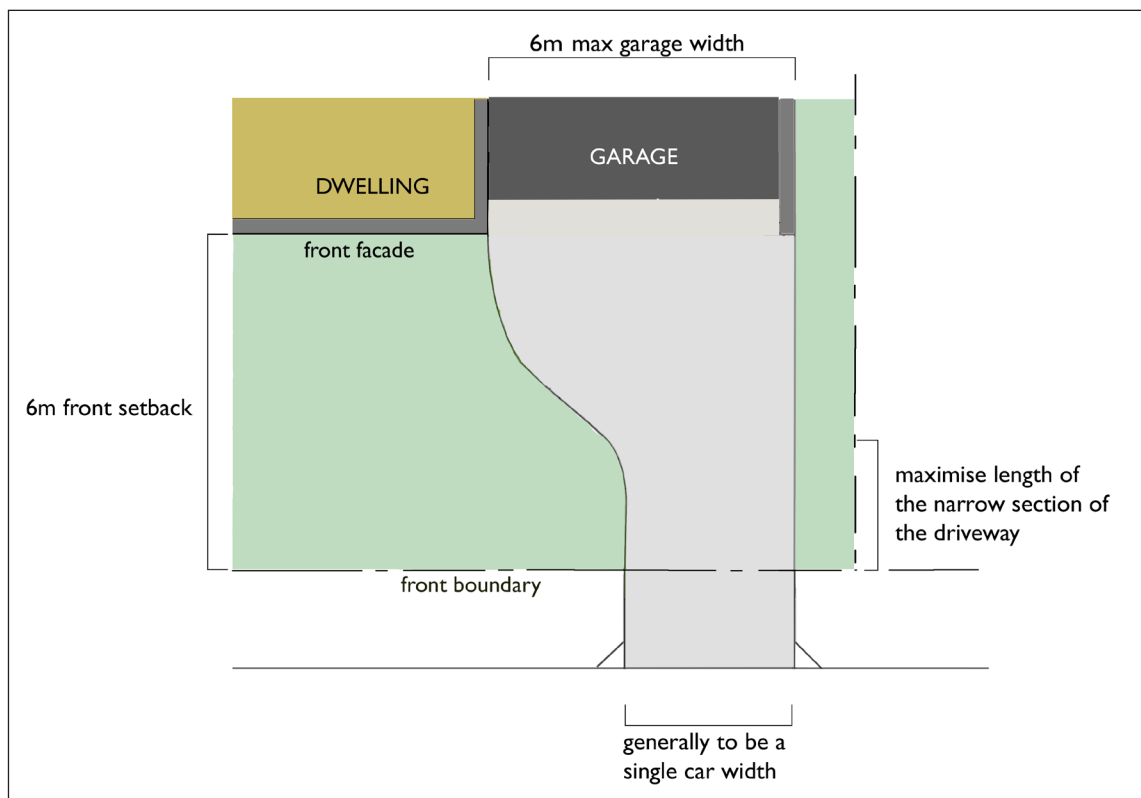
Driveway. The width of the driveway is to be minimised. The garage door is to be setback no more than 300 mm from the front of the structure above
